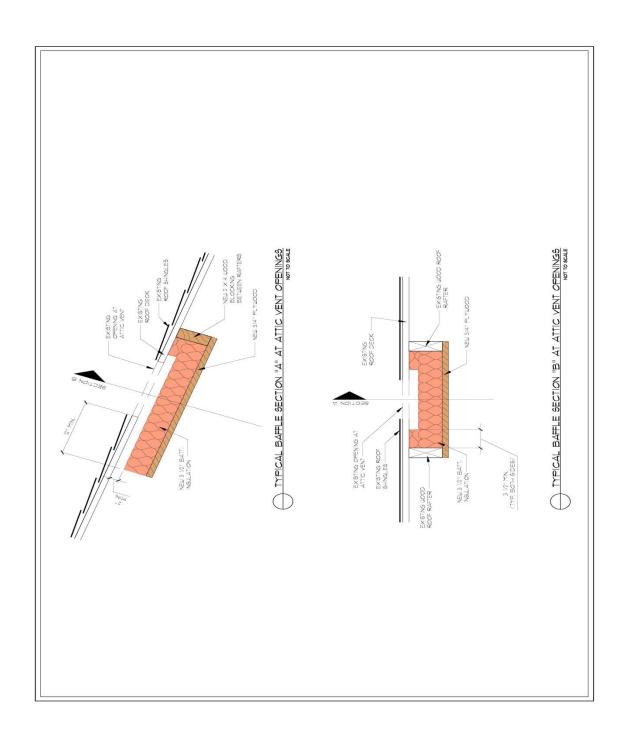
Typical Baffle Detail at Attic Vent Openings
